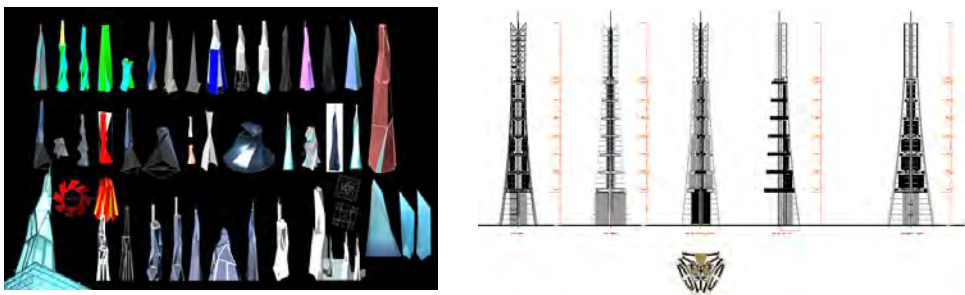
Innovative proposals of highly irregular shapes and complex structural layouts
